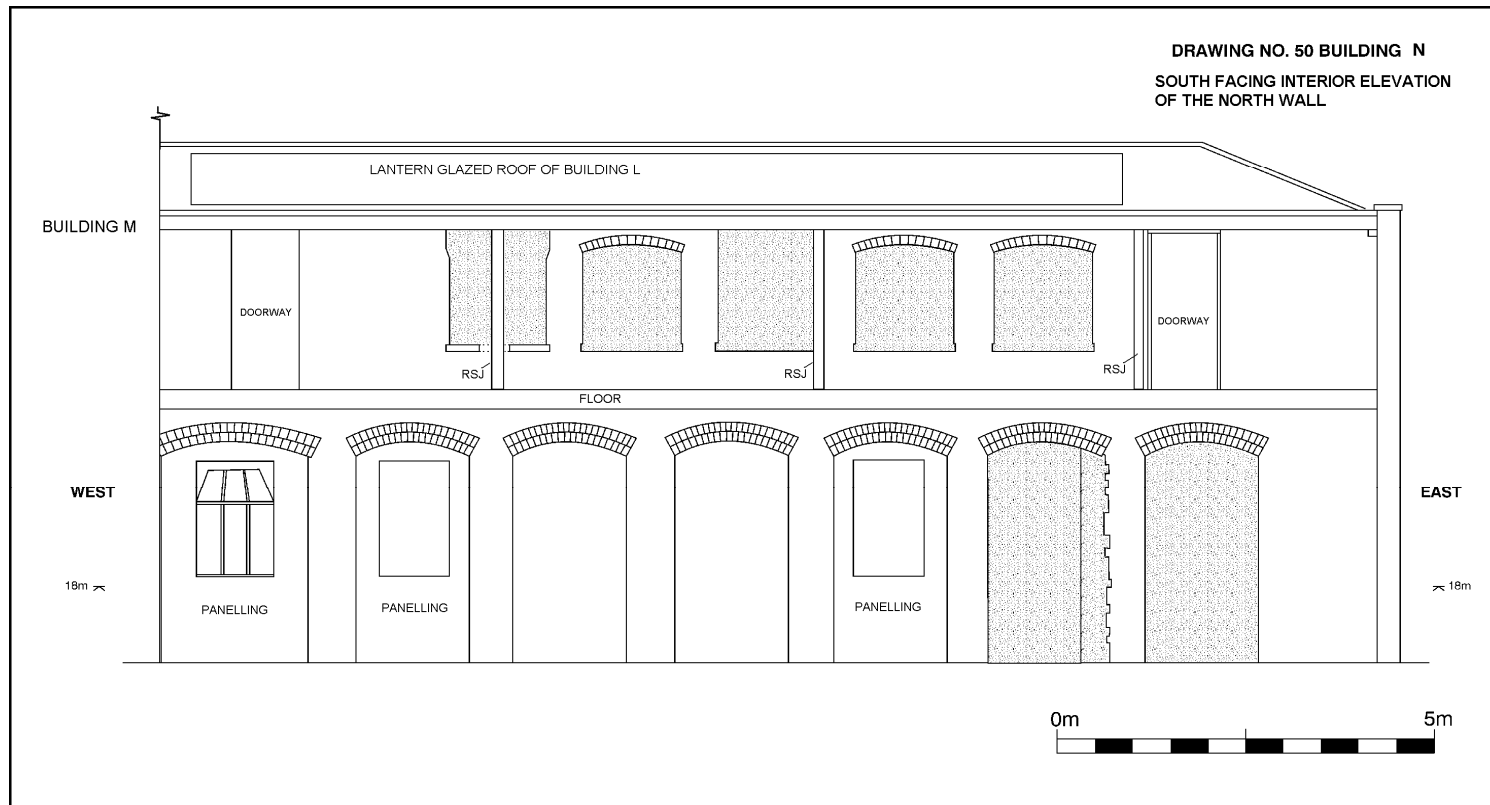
Survey drawing of the internal south facing of the north wall of Building N (scale 1:100)
